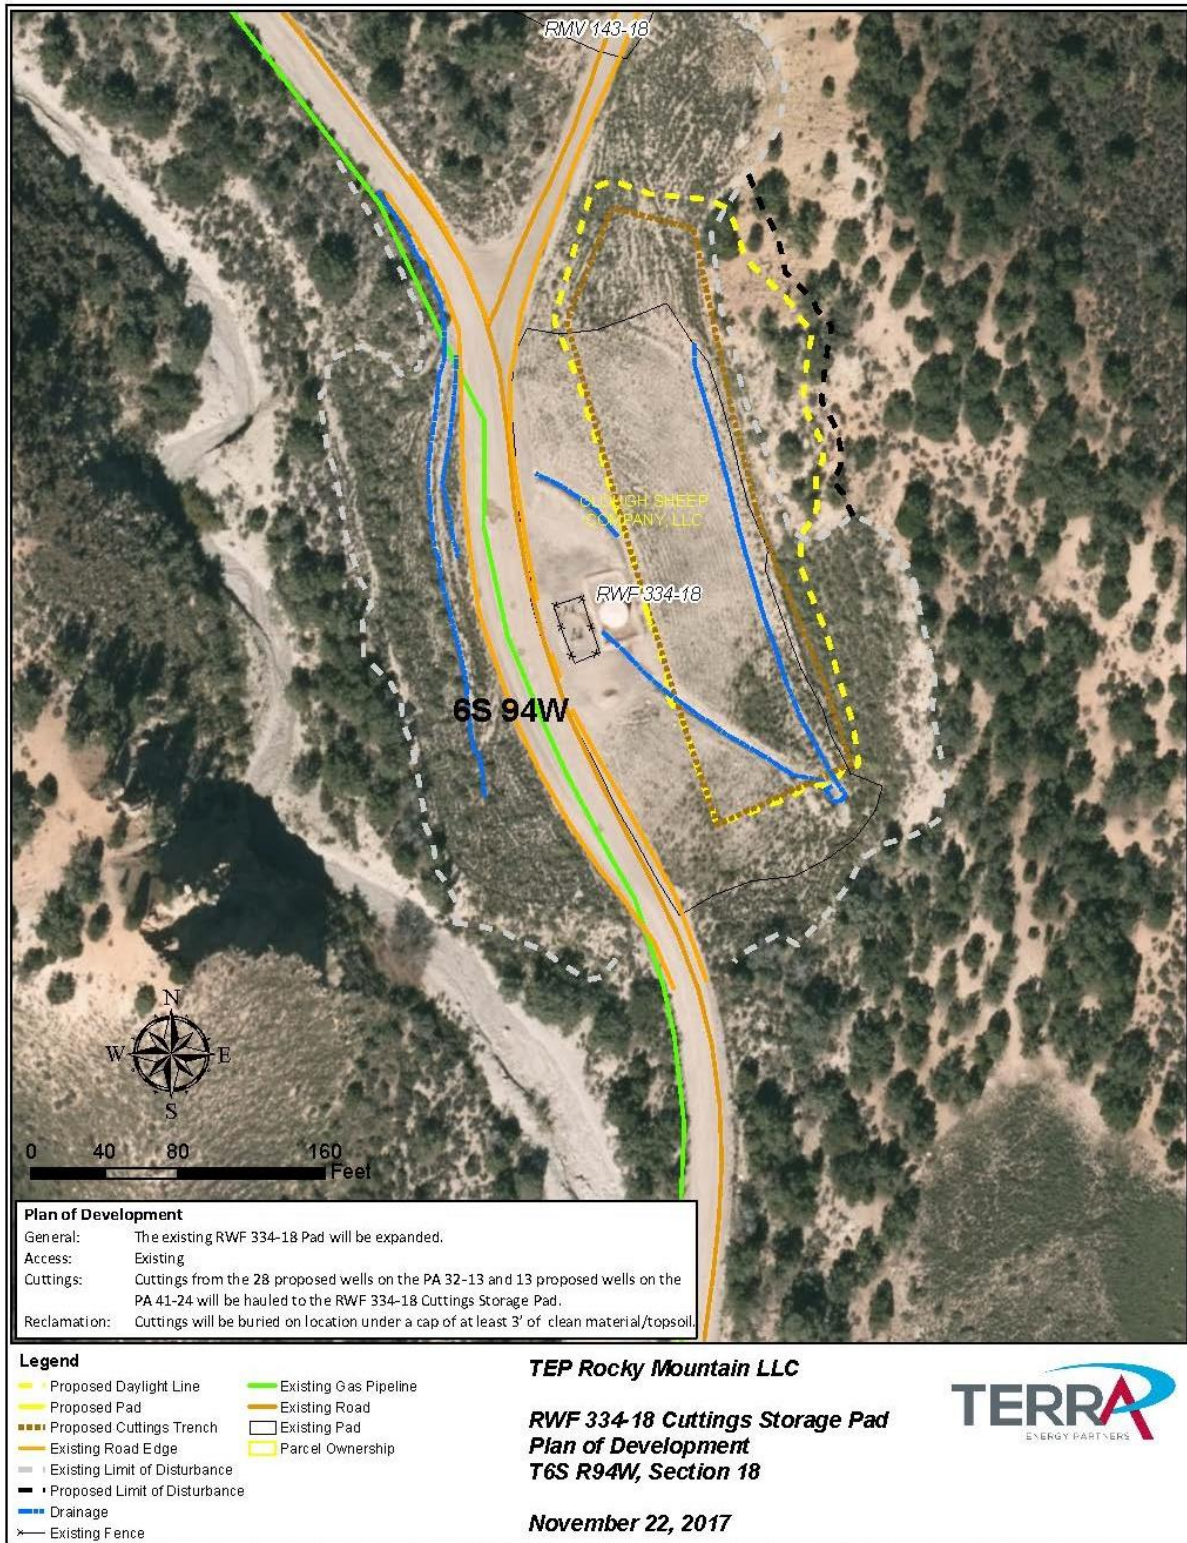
RWF 334-18 Cuttings Storage Pad Plan of Development
